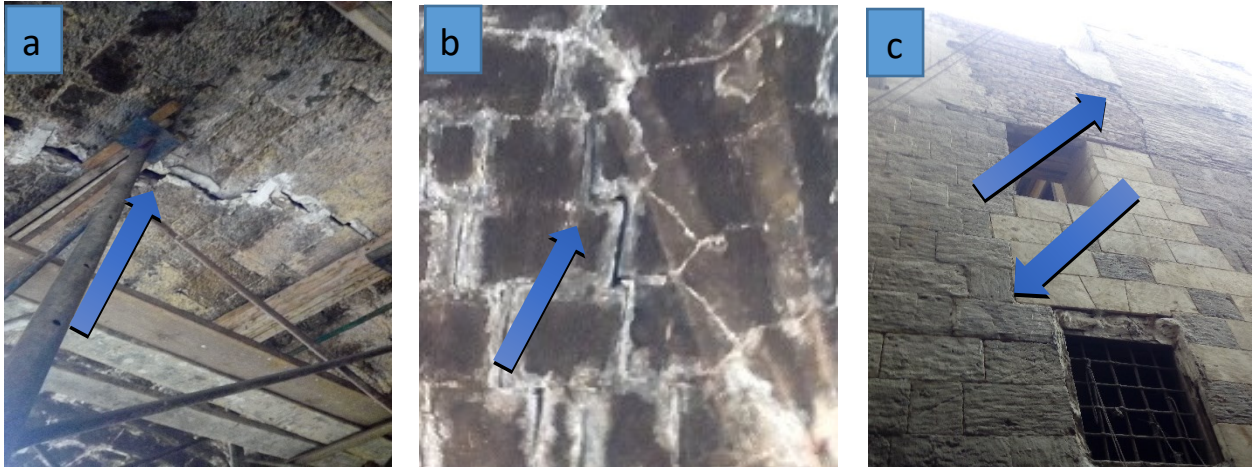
Cracks that occur as a result of soil weakness and mechanical vibrations. (a) Cracks in the ceiling of the building from inside. (b)Cracks in the walls of the building from inside. (c) Cracks in the walls of the building from outside.
